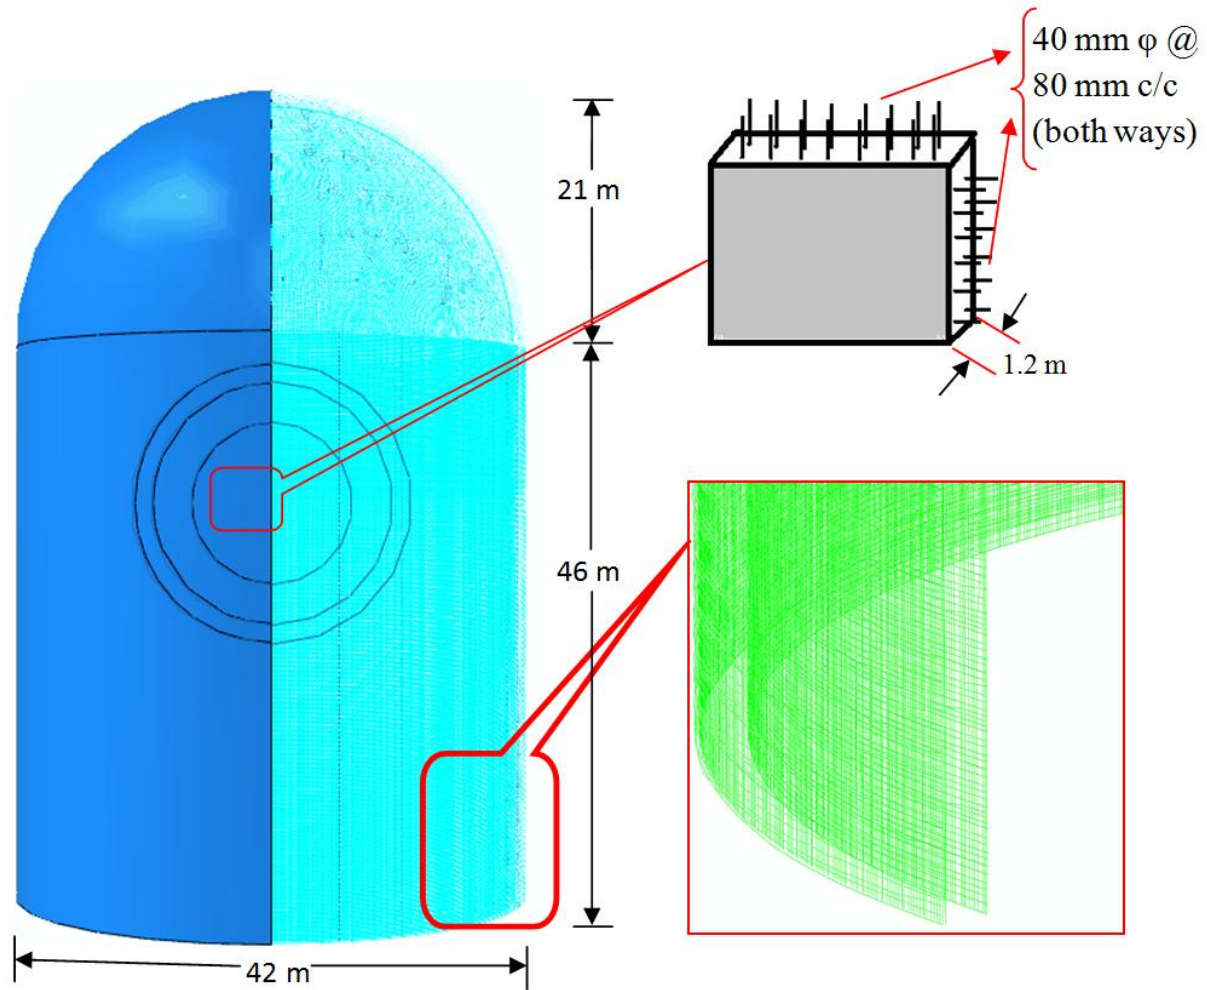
Reinforcement details of outer containment structure of NPP
